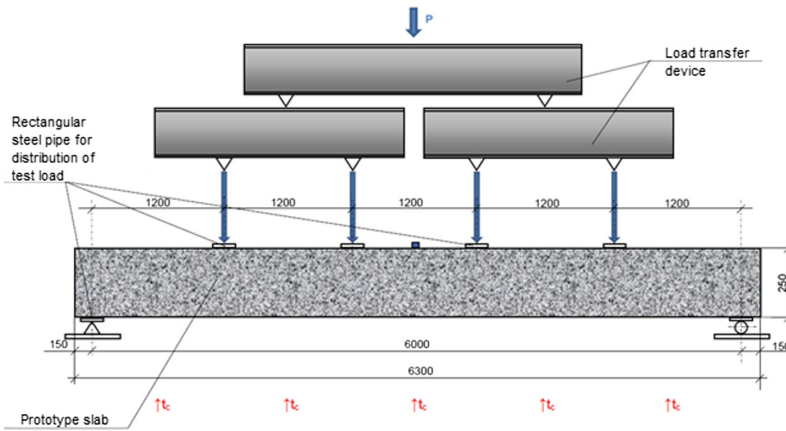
The scheme of support and loading of a prototype of a reinforced concrete slab.
